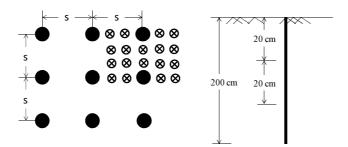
Configuration of pile installation, FVSTs positions, and vertical distance of FVST
